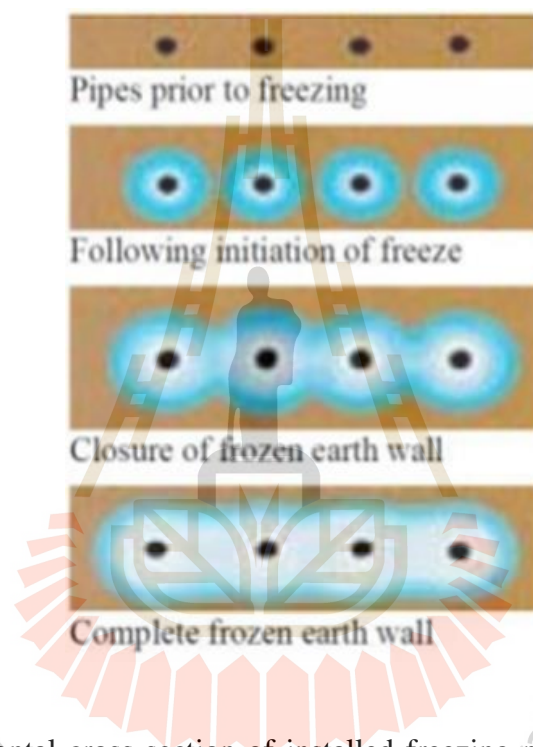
Horizontal cross section of installed freezing pipes in the soil and rock
